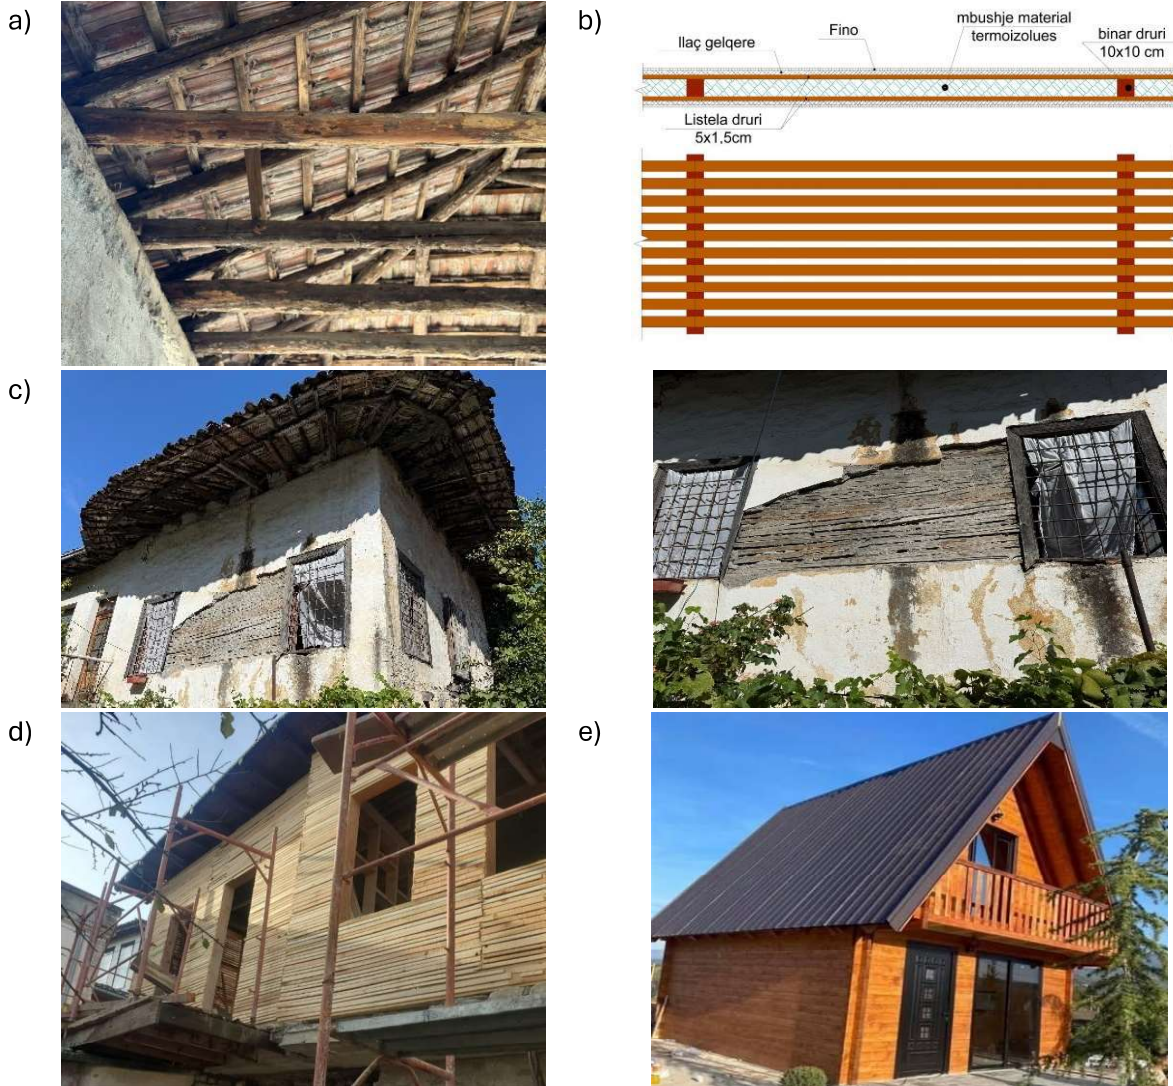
a) Timber roof, b) Çatma wall details; c) Traditional house with çatme; d) reconstructed building with çatma; e) Timber touristic building
